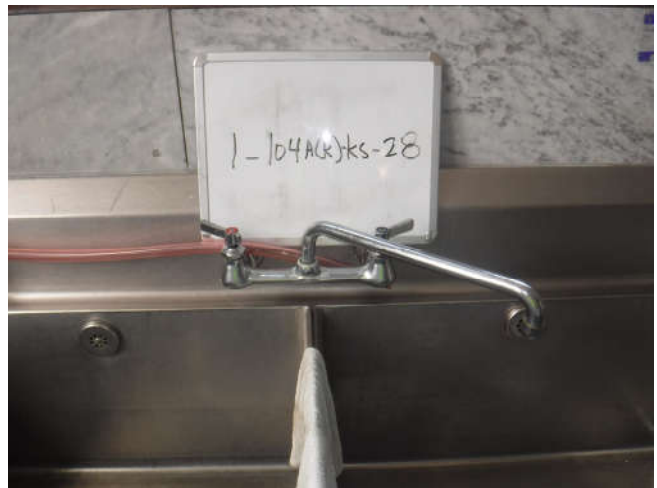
kitchen faucet, located on the 1st floor in kitchen @ dish washing station (right)
